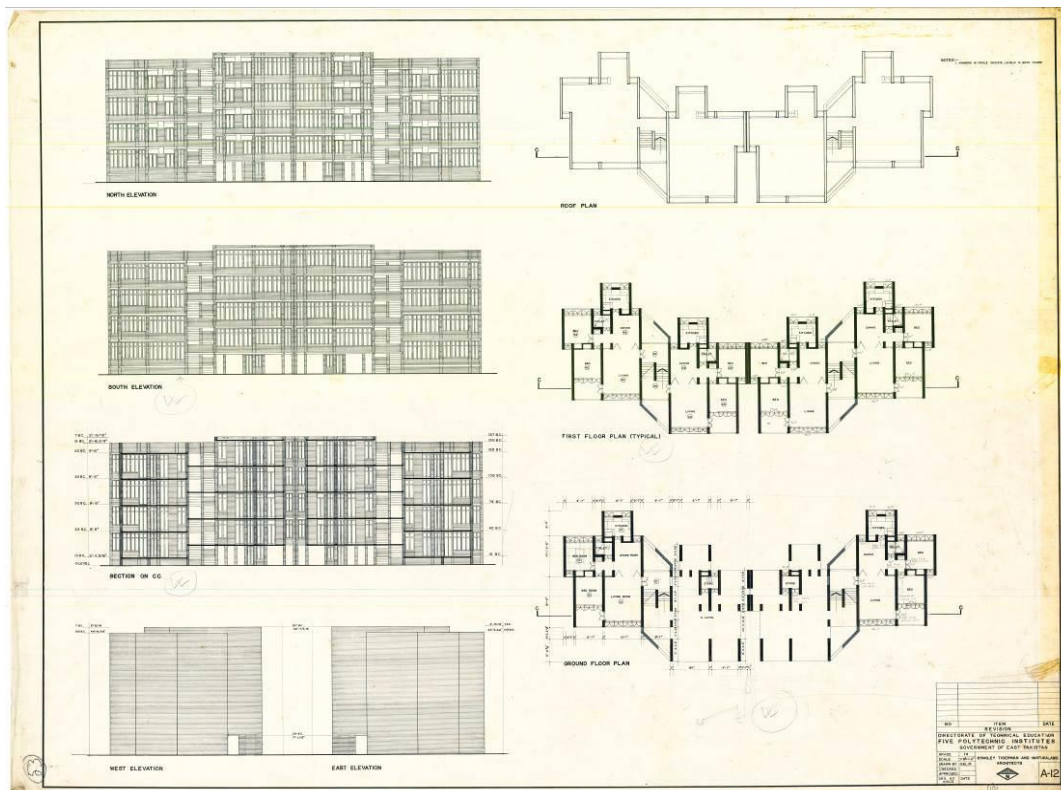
Floor Plans, Elevations and Sections. Housing, Polytechnic Institute, 1966.
